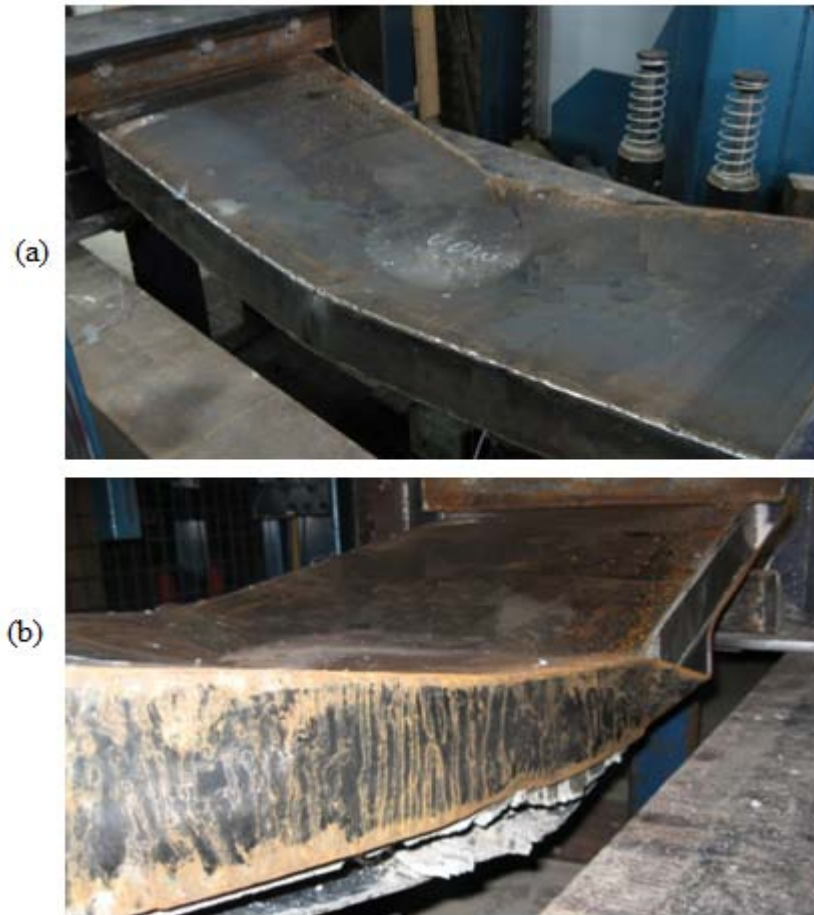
Damage on the Fully enclosed panel: (a) buckling of the end cap and indentation of the top faceplate, (b) failure of the welding between the steel faceplates and end cap.
